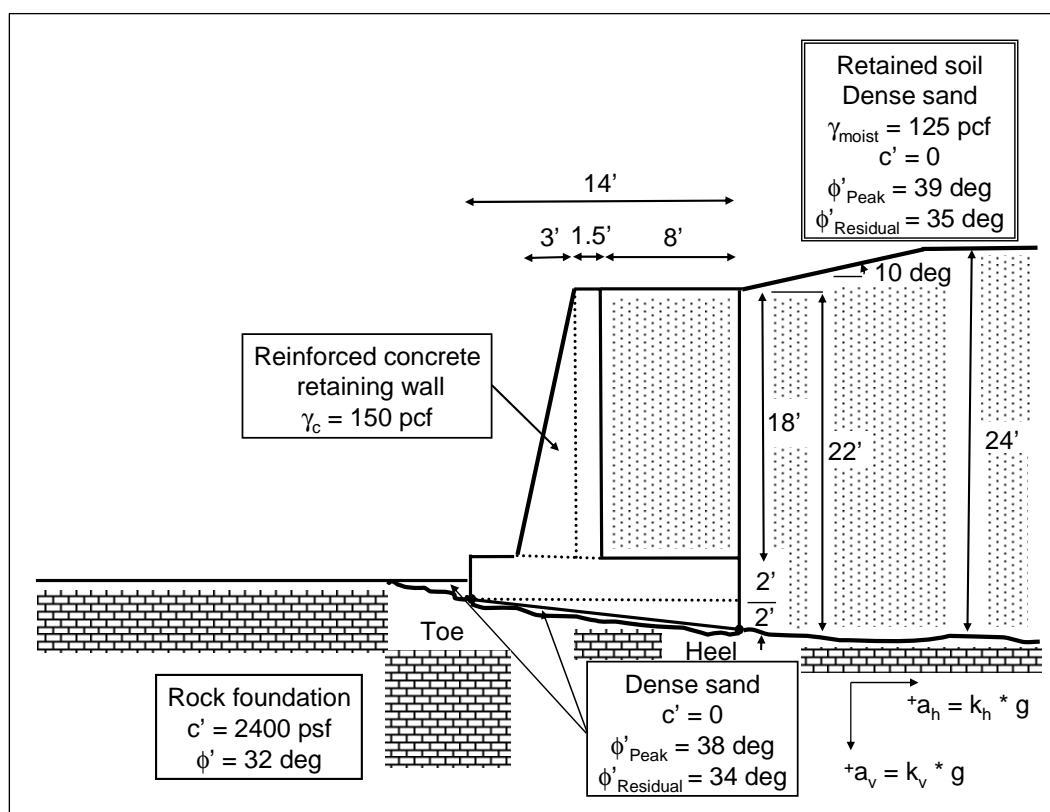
Rock-founded earth retaining wall for Example 1.
